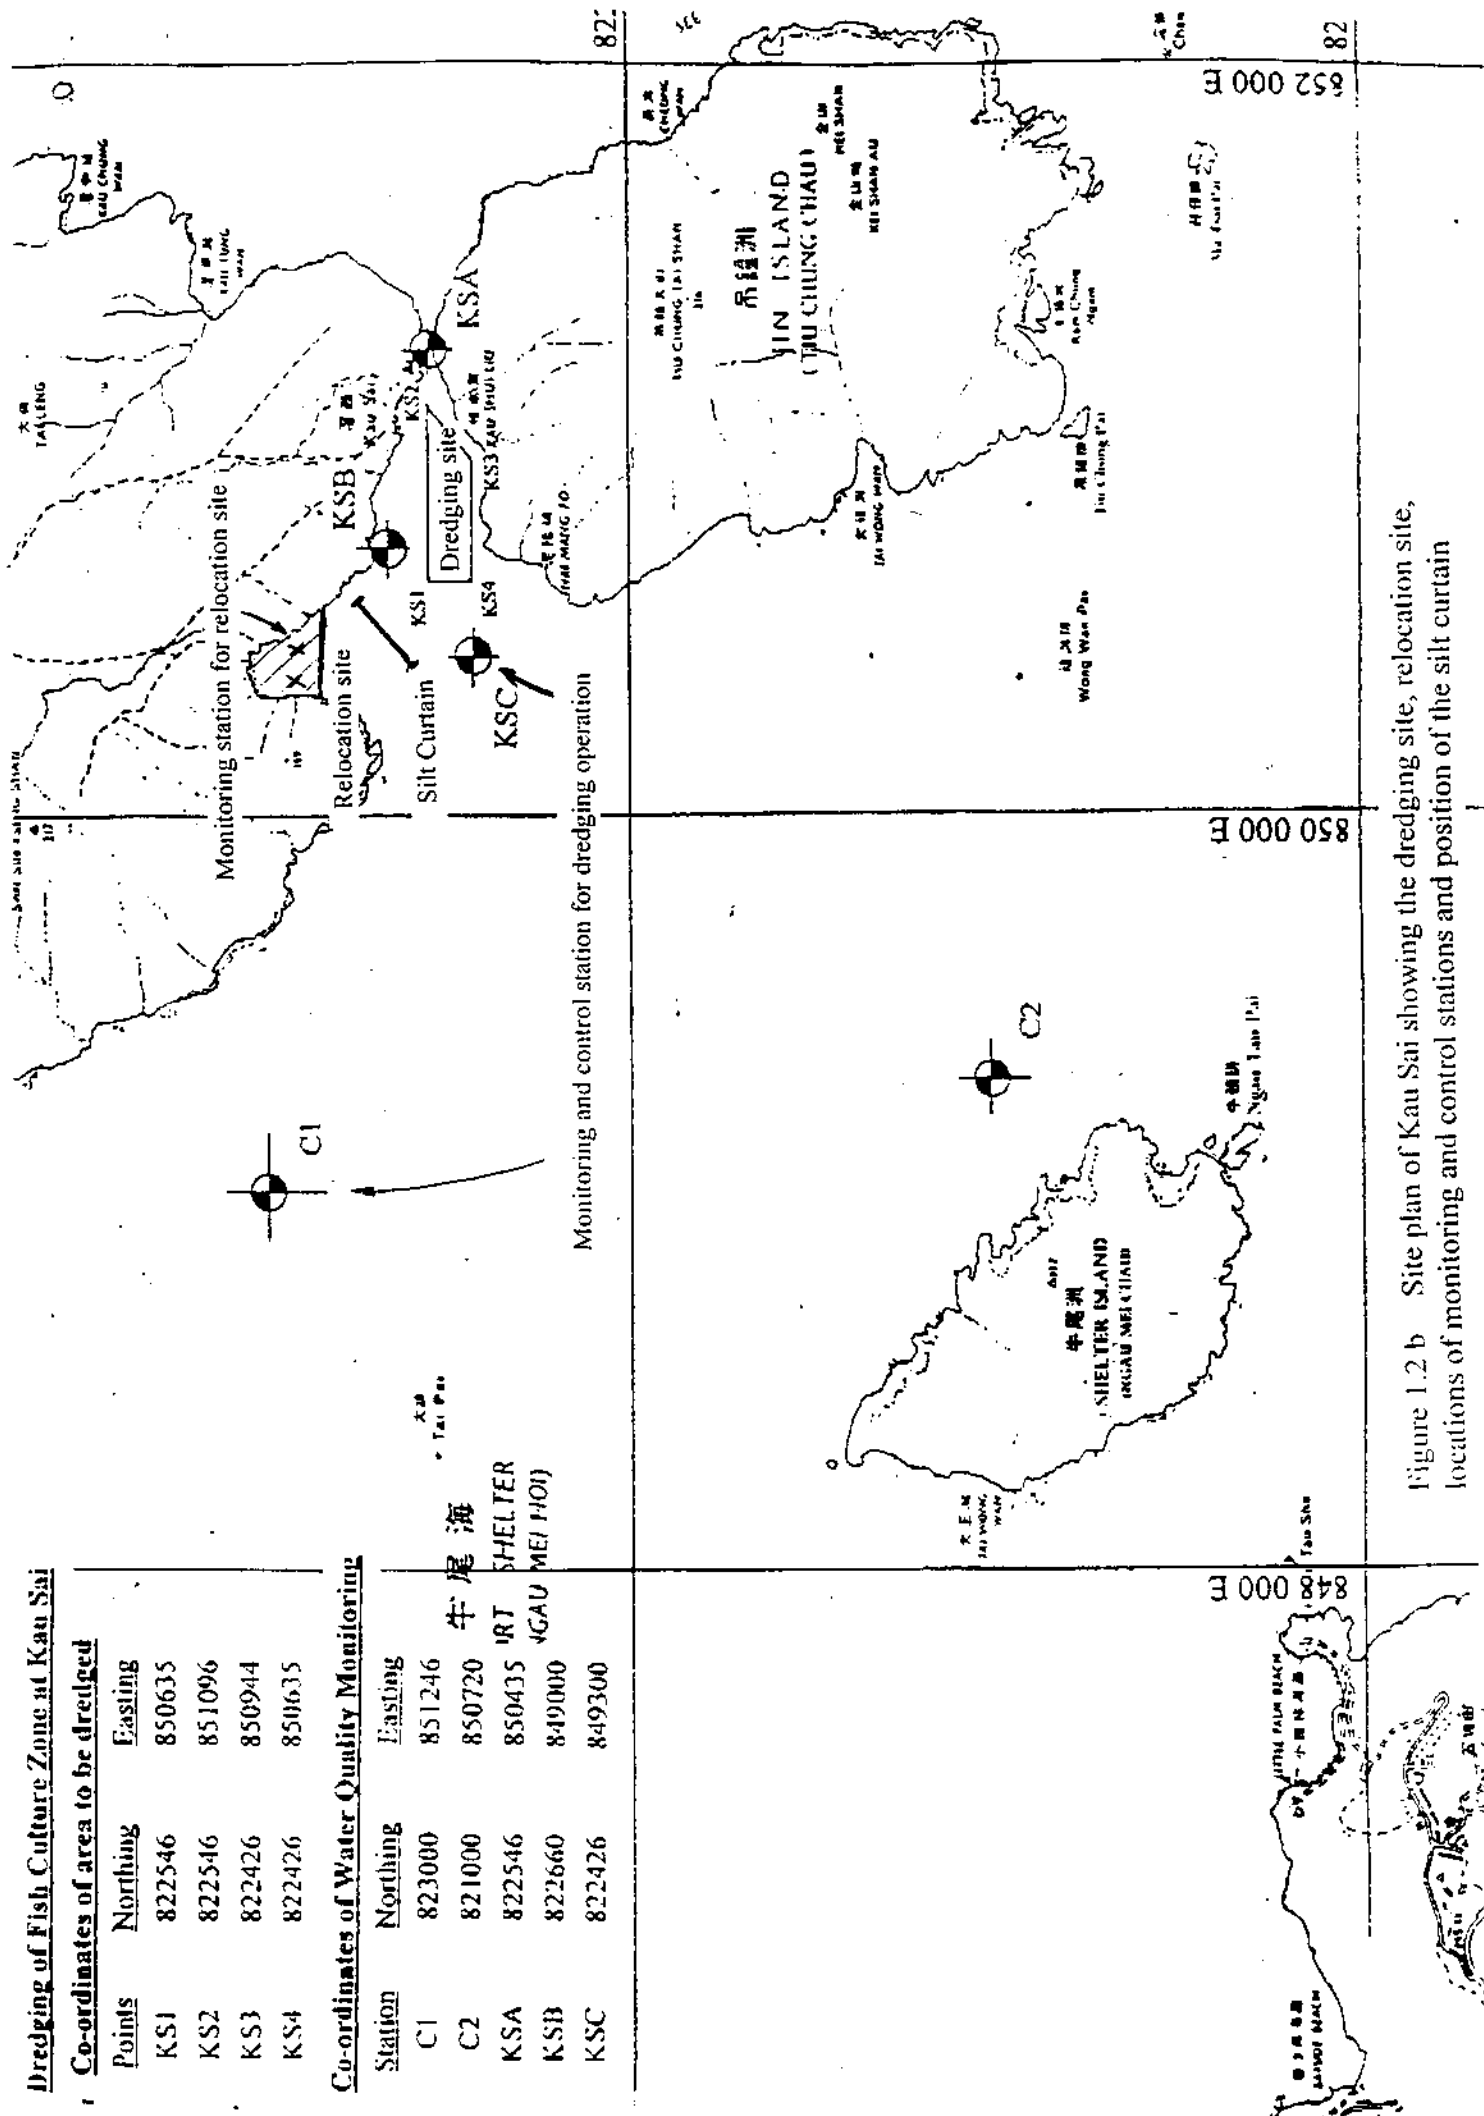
b Site plan of Kau Sai showing the dredging site, relocation site, locations of monitoring and control stations and position of the silt curtain
